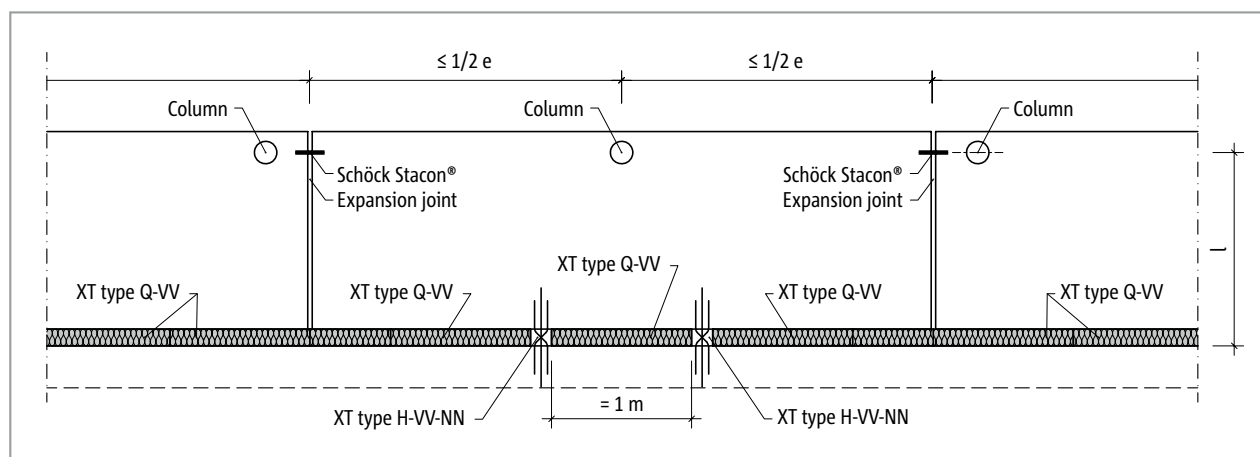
Schöck Isokorb® XT type H: Expansion joint arrangement
